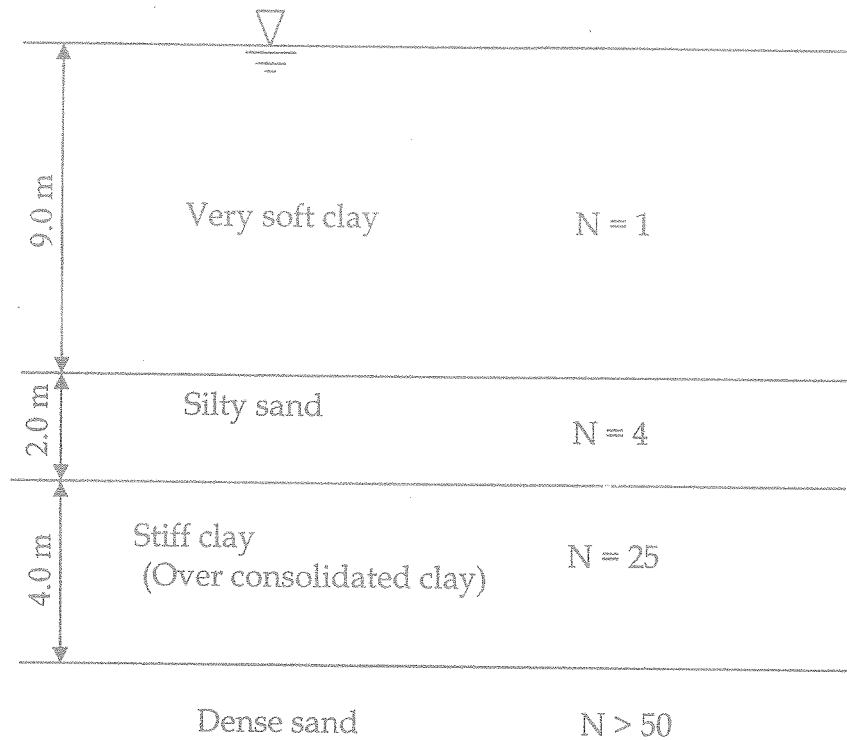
Sub-surface soil profile at the proposed Facility Building
